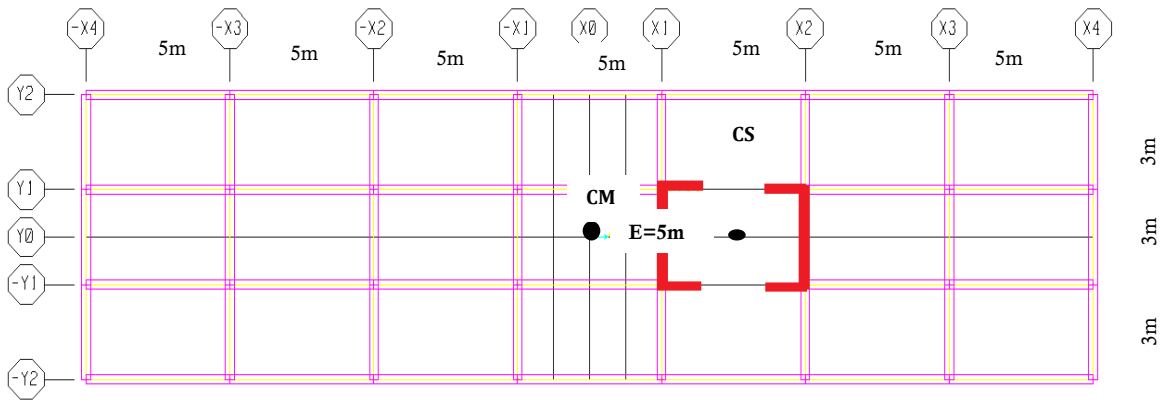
2: Structural Wall at Axis $X_1_X_2$, Type B
